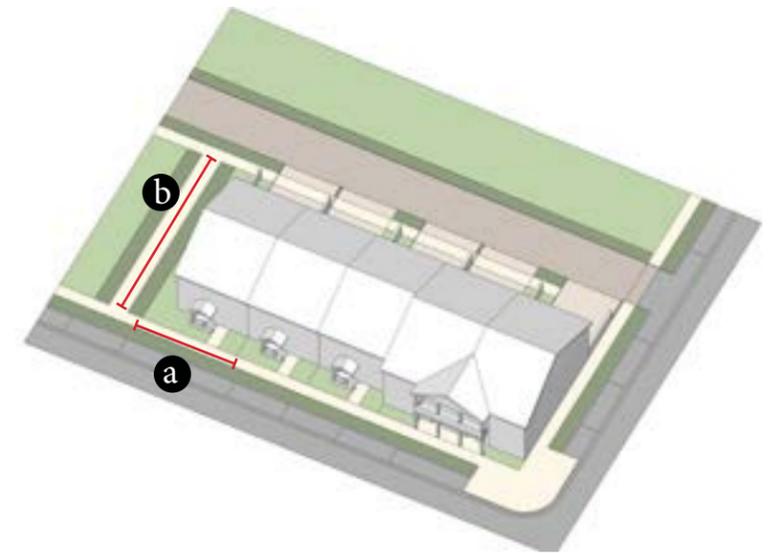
TOWNHOUSE BUILDING TYPE 2
